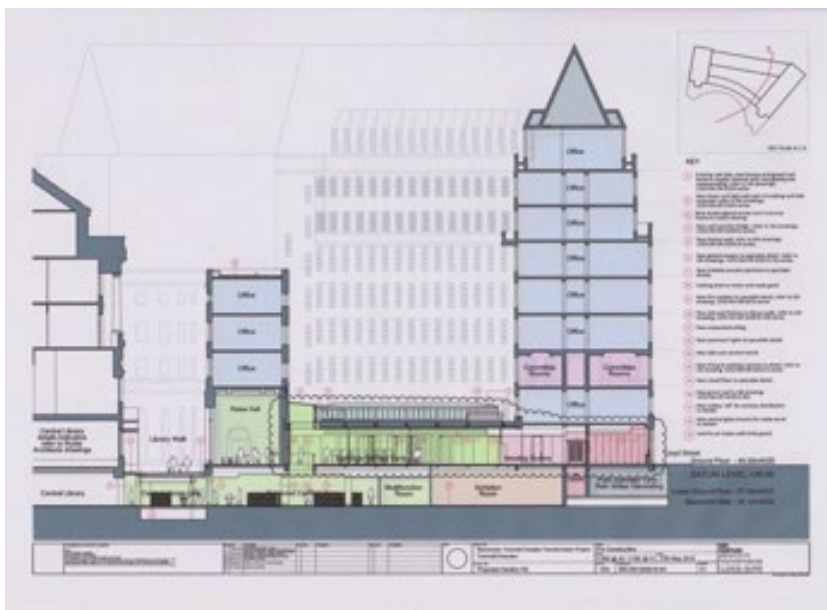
Sectional Elevation of Manchester Town Hall Extension.
